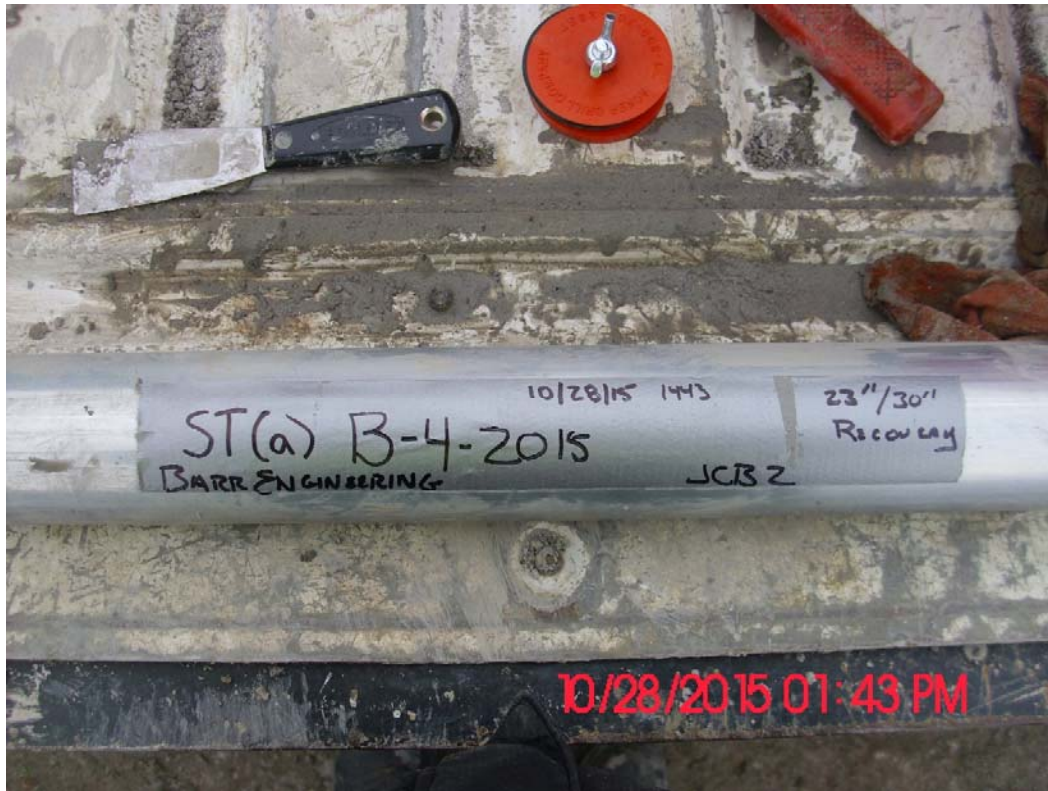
West Scrubber Pond liner sample extruded from Shelby tube prior to testing
